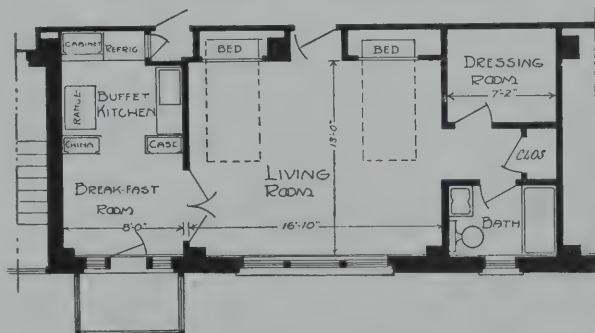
Twin Bed Unit for Shallow Depth in Plan
